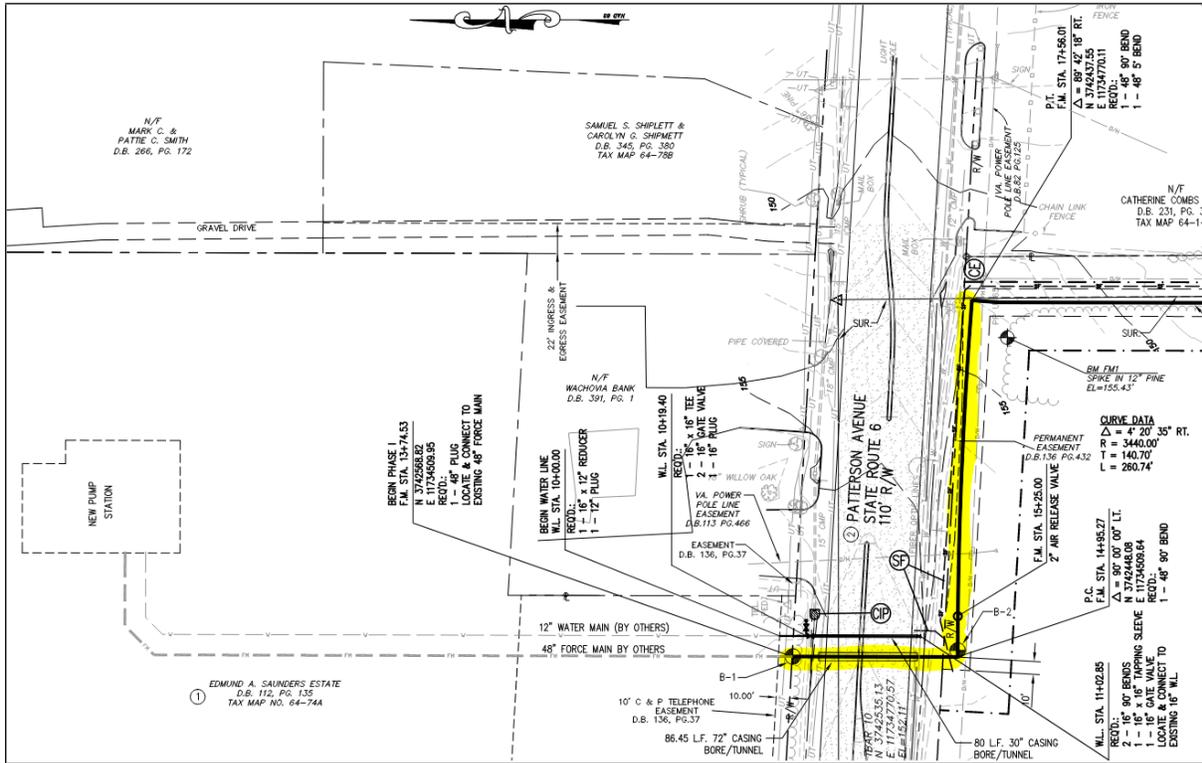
Existing EGFM Section 1 Alignment (Highlighted)
